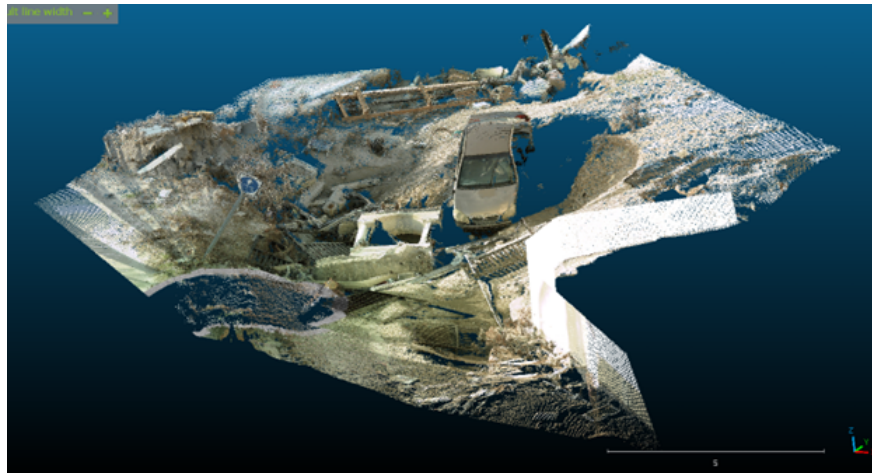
Terrestrial LiDAR scan of depression feature adjacent to road and apartment building. Coordinates 26.446486, -81.937939
